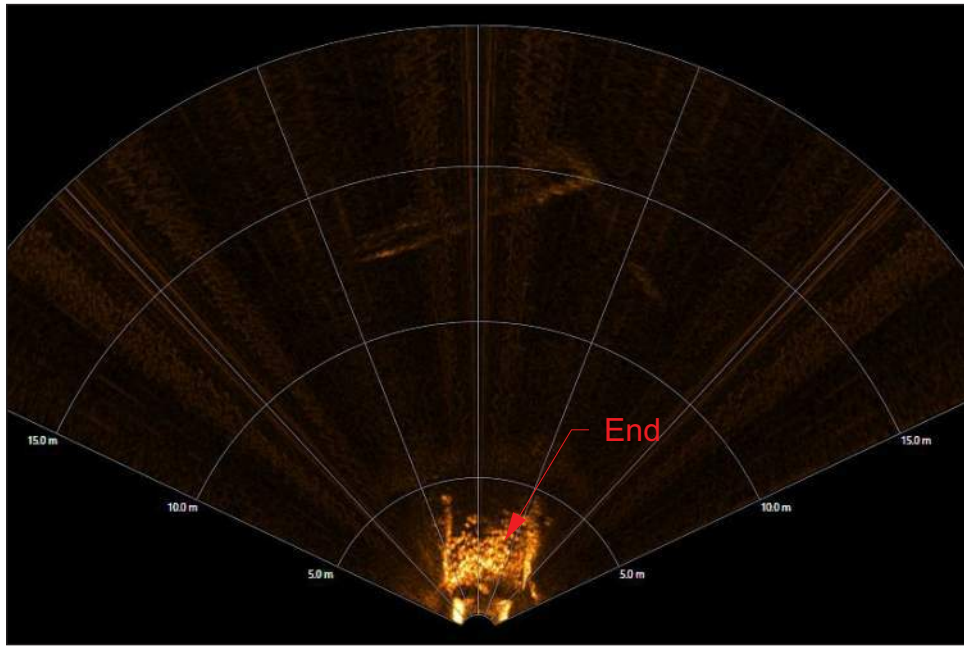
Outfall outlet at 788 feet downstream of Access Point 1.
